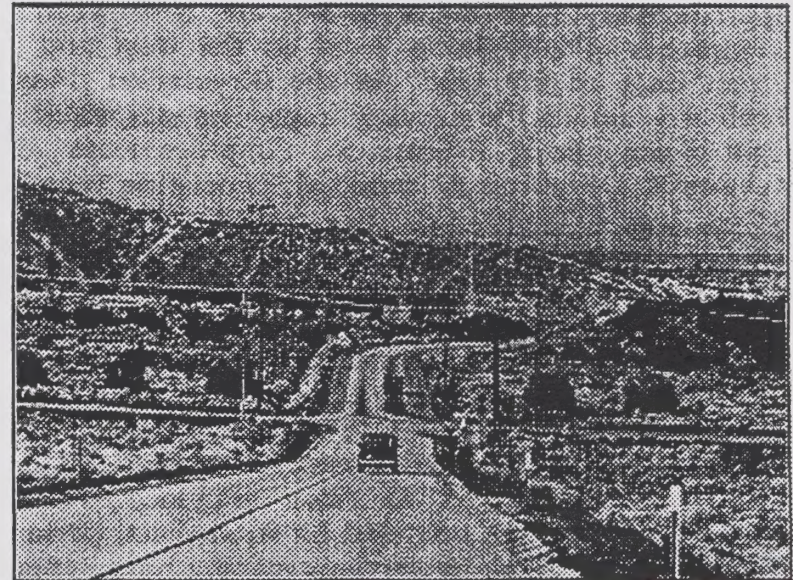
Existing Tierra Subida Avenue streetscape facing north from the CA Aqueduct.
